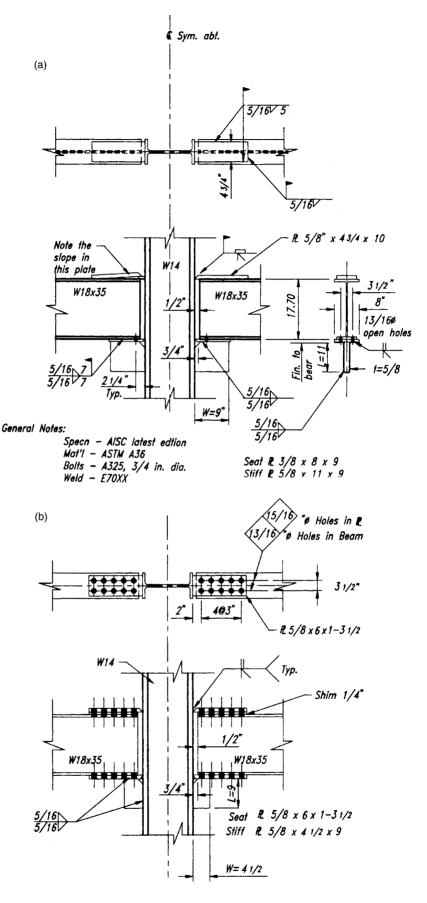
Beam–column welded and bolted connections: (a) welded connections; (b) bolted connections (based on AISC/LRFD specifications)
